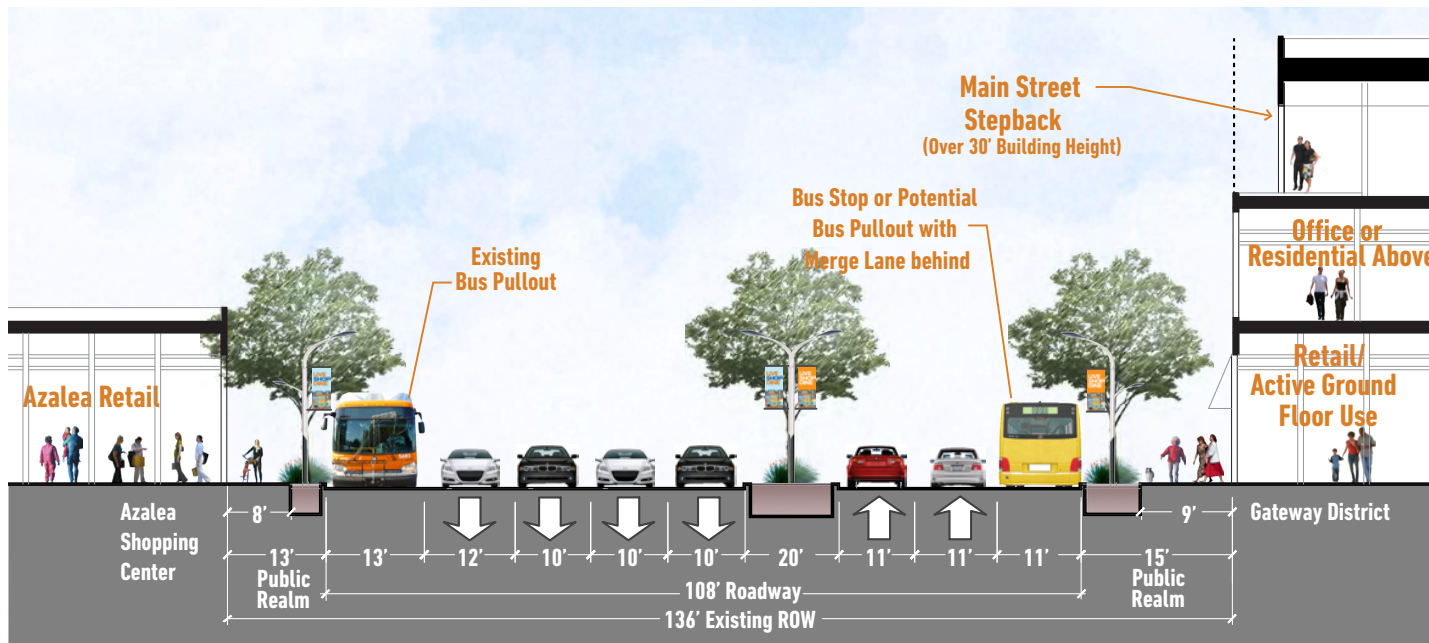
Atlantic Avenue Future Improvements Cross Section
